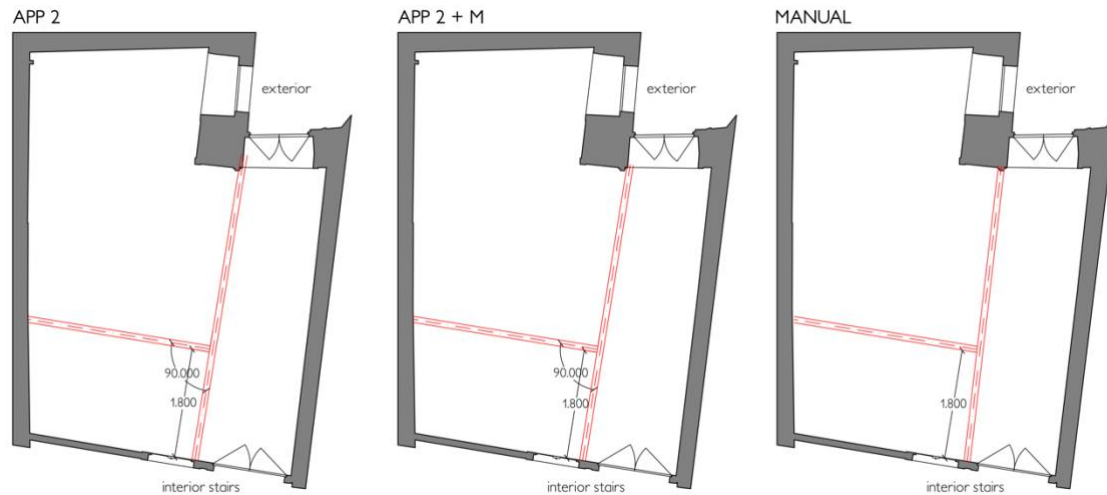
Application of walls generated in APP 2, APP 2 + M and Manual plans to TLS plan (Brandão & Paio, 2019).
